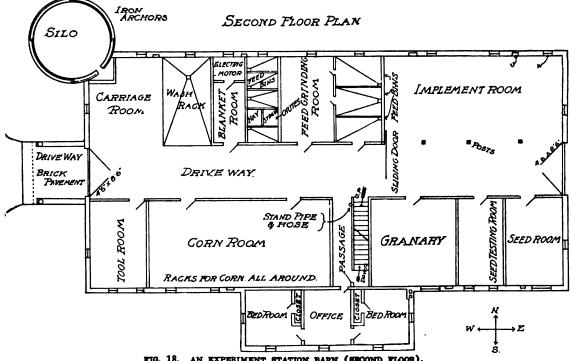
AN EXPERIMENT STATION BARN (SECOND FLOOR).
